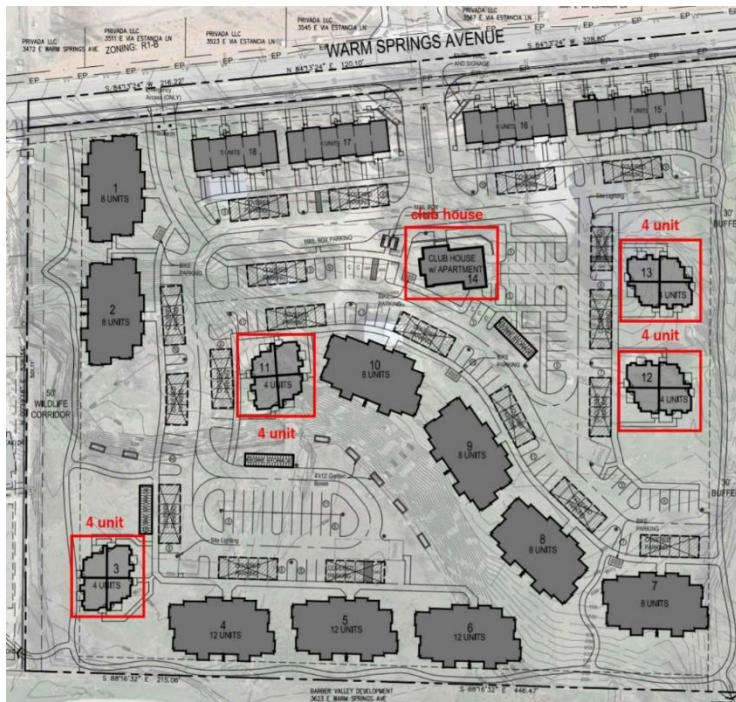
Proposed apartment site plan, illustrating 4-unit and management-club house locations
